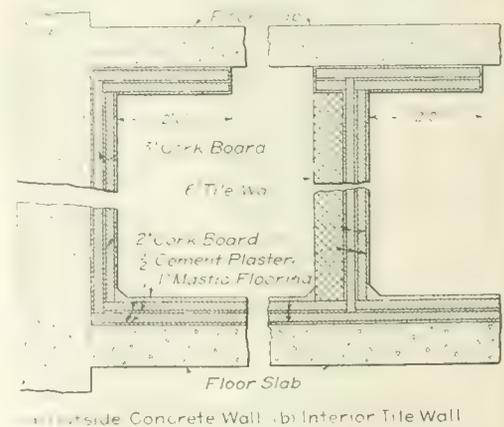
Type of Insulation Used for Exterior Concrete and Interior Tile Walls of Cold Storage Section of Warehouse in Seattle, Wash.
